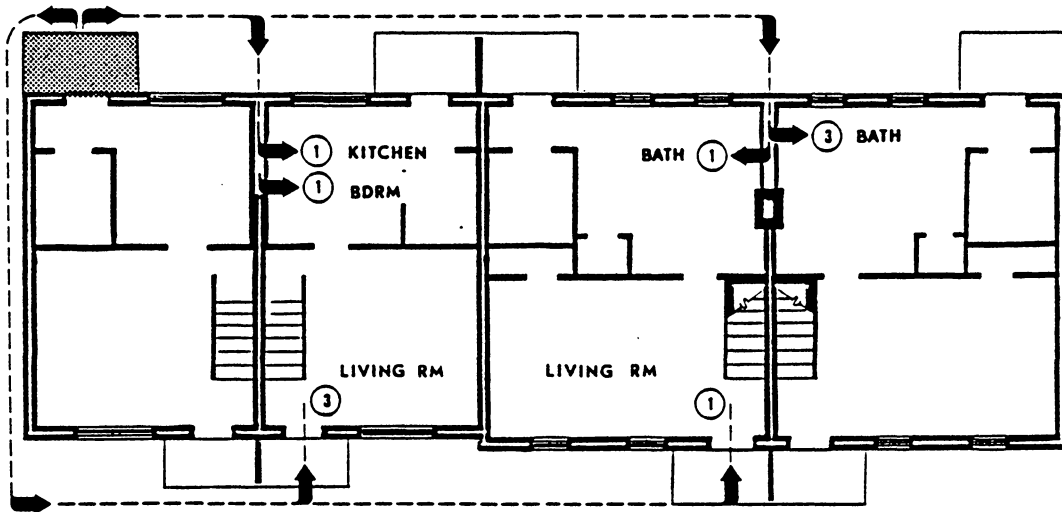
Oriental cockroaches, last observed outdoors at shaded porch, found indoors, building 1, Roanoke, Va., Summer 1985; ① ③ = Number of cockroaches found in each room
